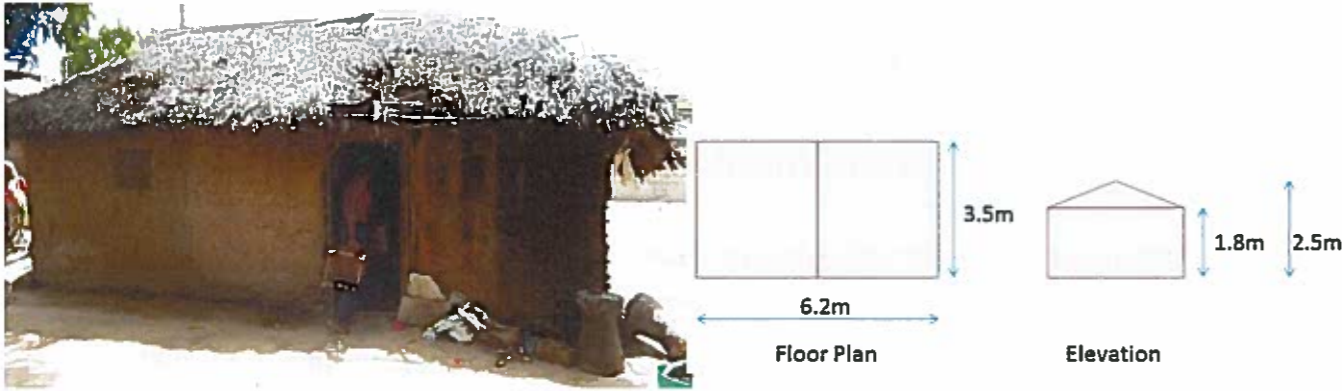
Photo and Layout of Traditional Mud House, House 6 (Author)
